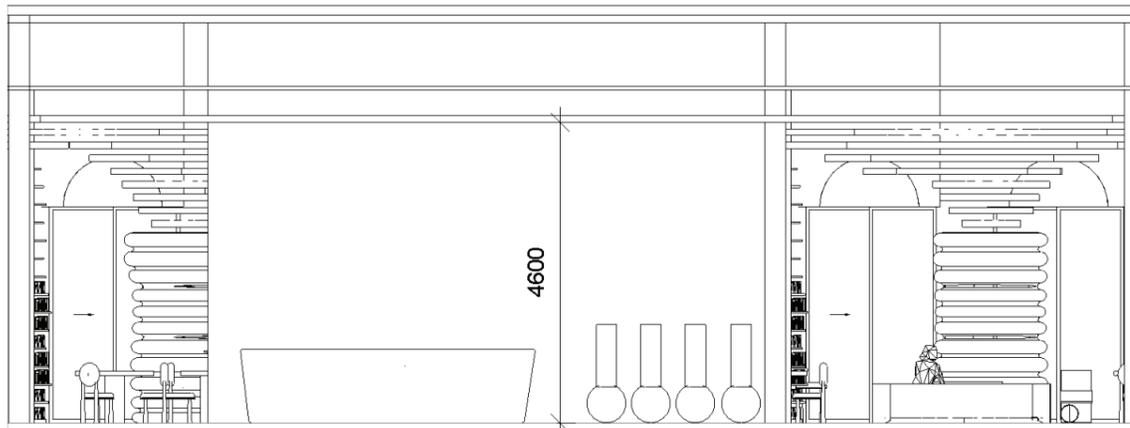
Reception Section Illustrating the height between the ceiling and finish floor
